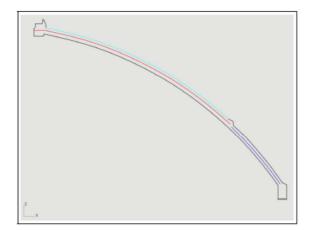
Locations of the reinforcement within the rib system body; dome shell is depicted in light blue, rib reinforcement is in red, crown reinforcement is in dark blue, and lower beam reinforcement is in dark green.
